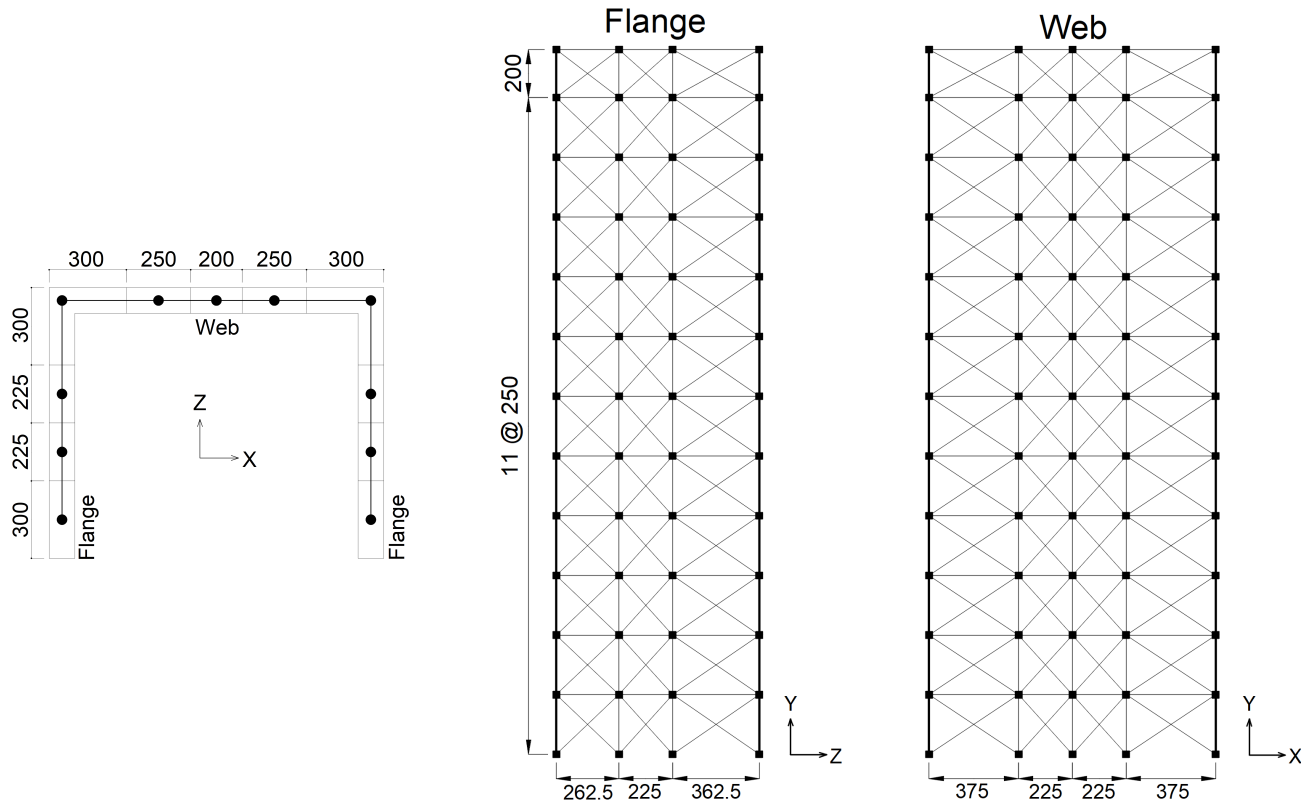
Plan and elevation views of the beam-truss model for TUD [Unit: *mm*].
